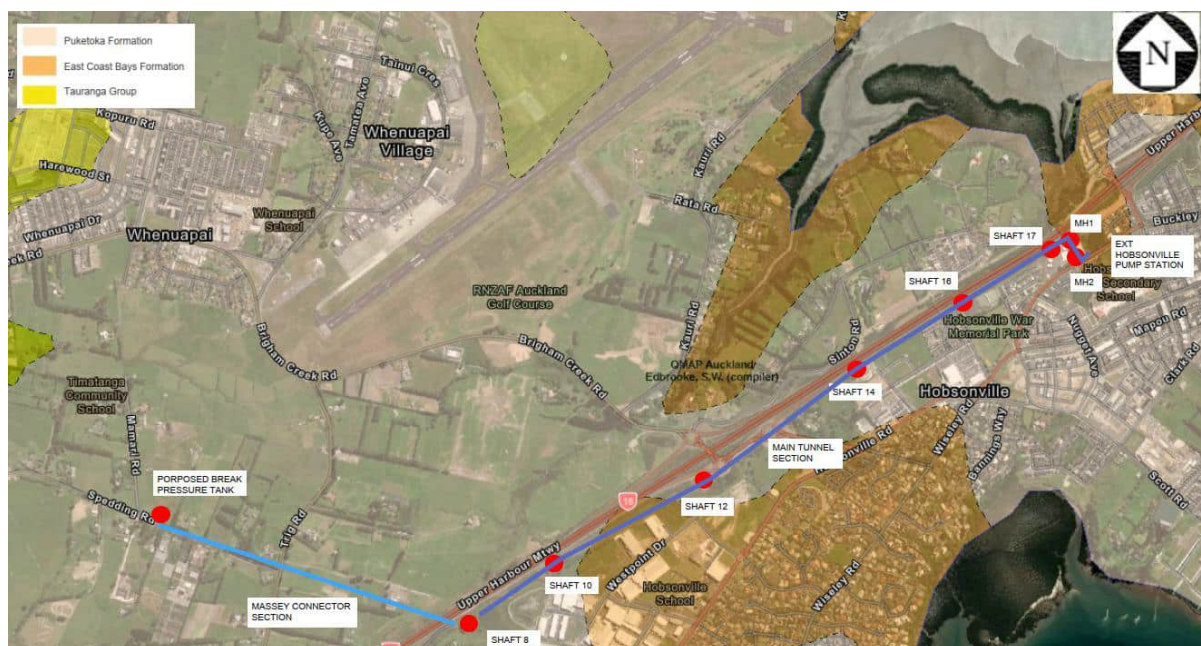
Proposed Whenuapai Redhills Wastewaters Servicing Scheme
